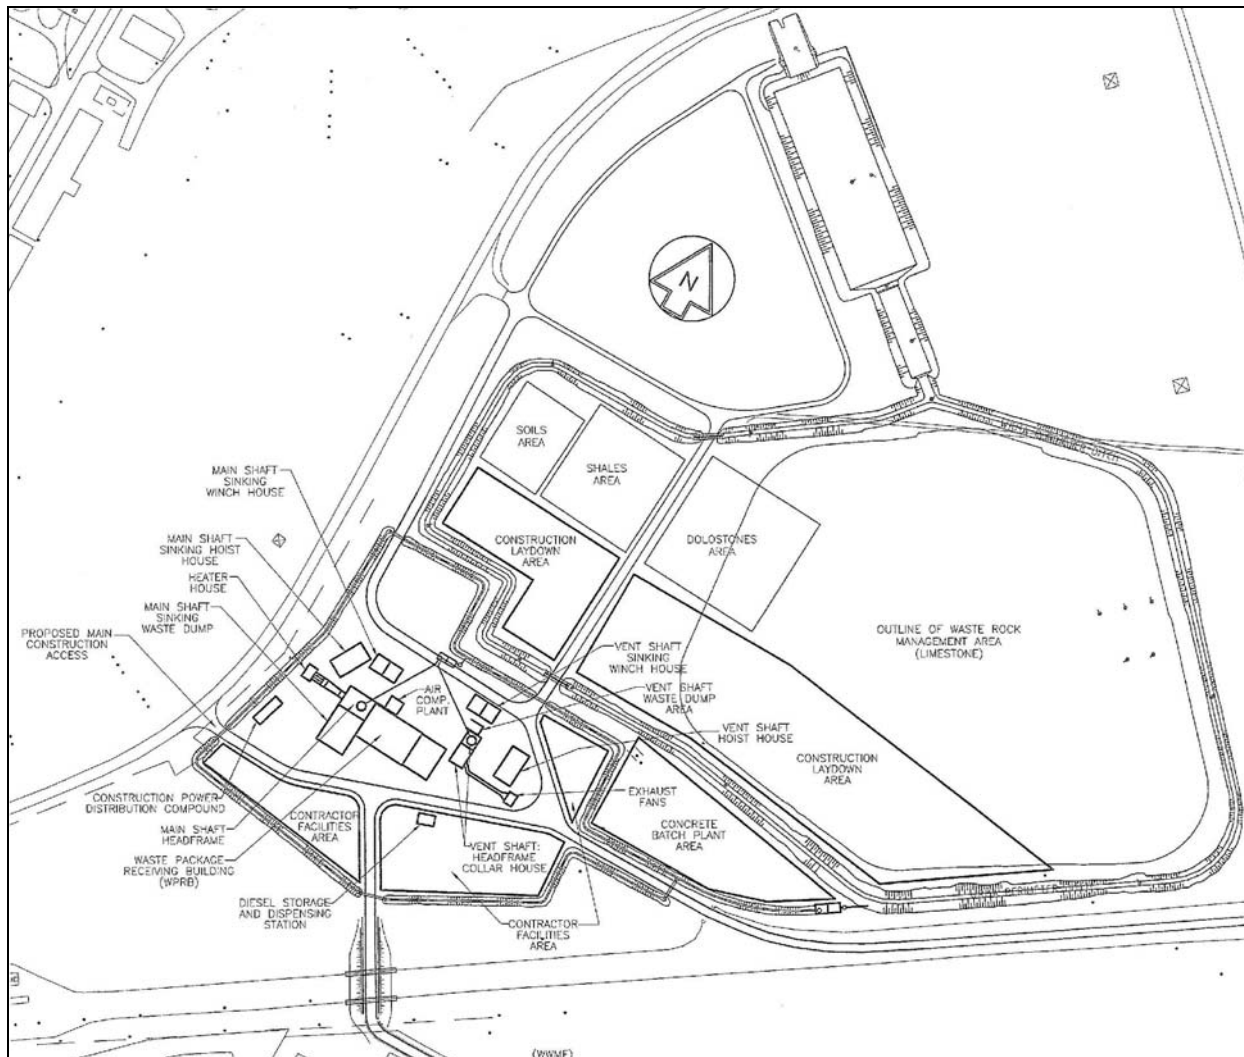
Site Preparation and Construction Phase Layout
